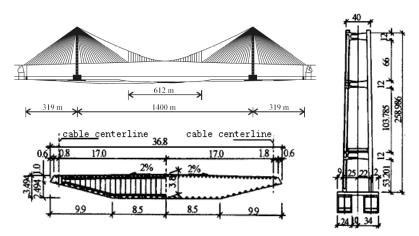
Elevation of the cable-stayed-suspension hybrid bridge (Unit: m)
